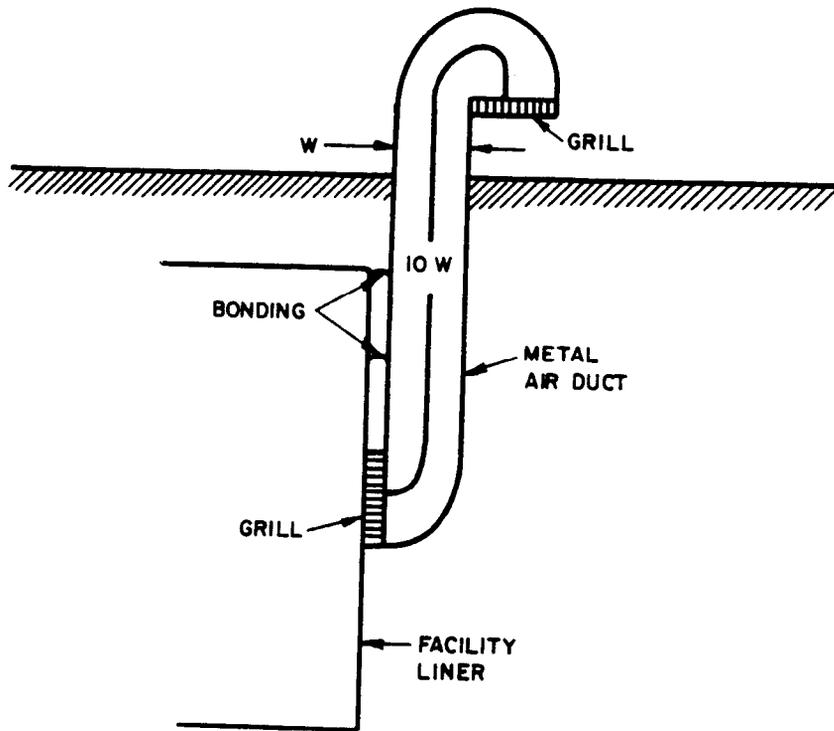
Air vent HEMP protection design. (Source: ref 5-7)
